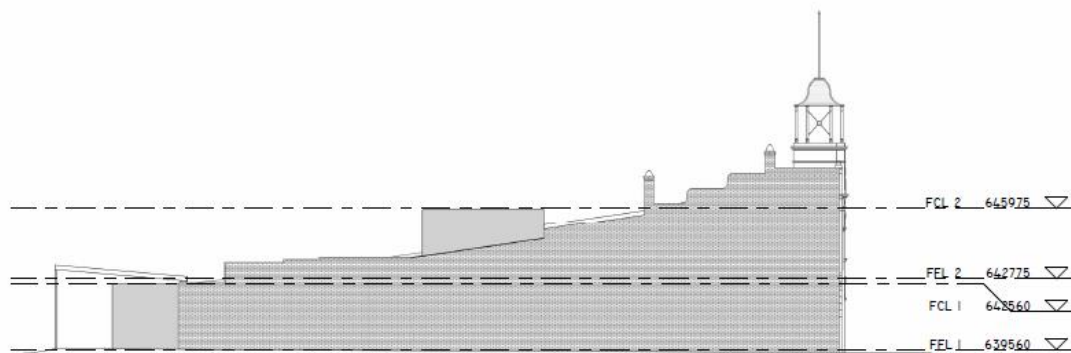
Western elevation – the massing of the original is retained. (Source: TLA)
